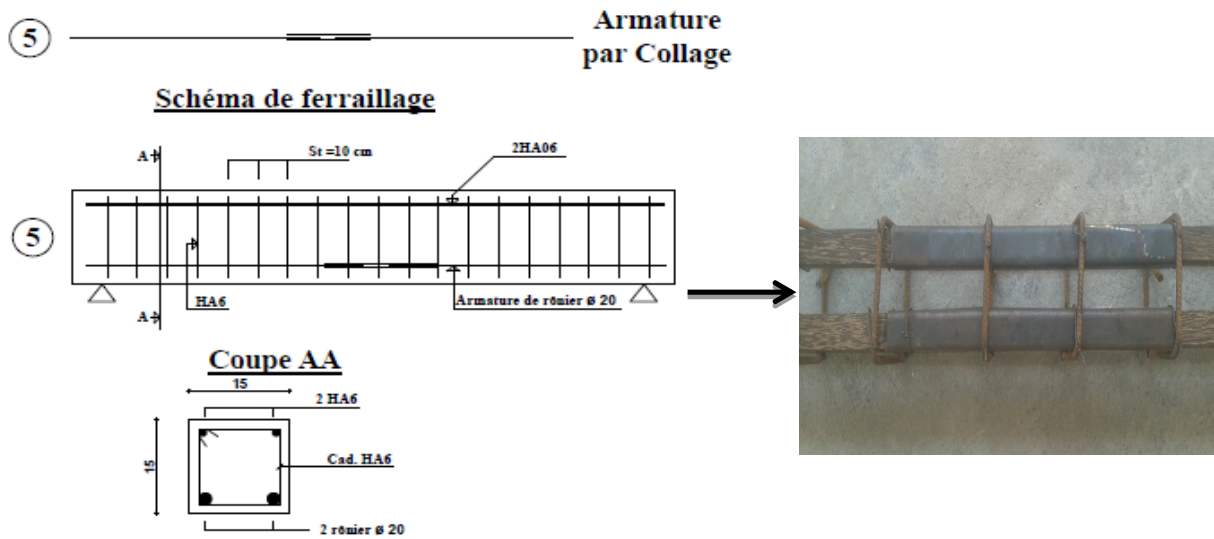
Beam reinforced with palm assembled by sticking with fiiron galvanized tubes in laminations shape
